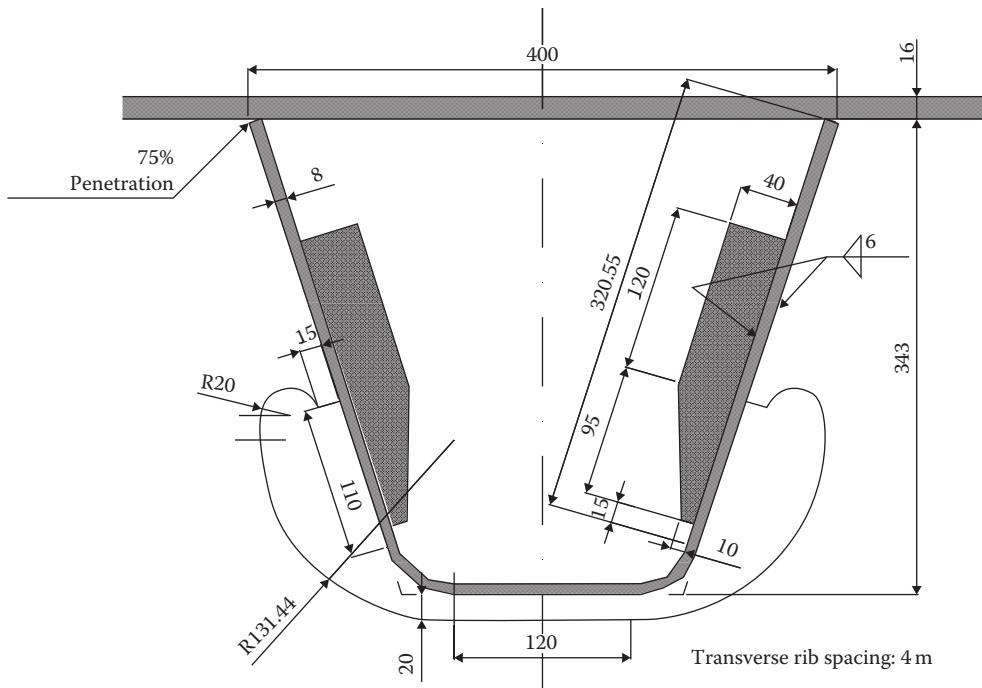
Connection details of orthotropic steel bridge decks for Tokyo Gate Bridge.
